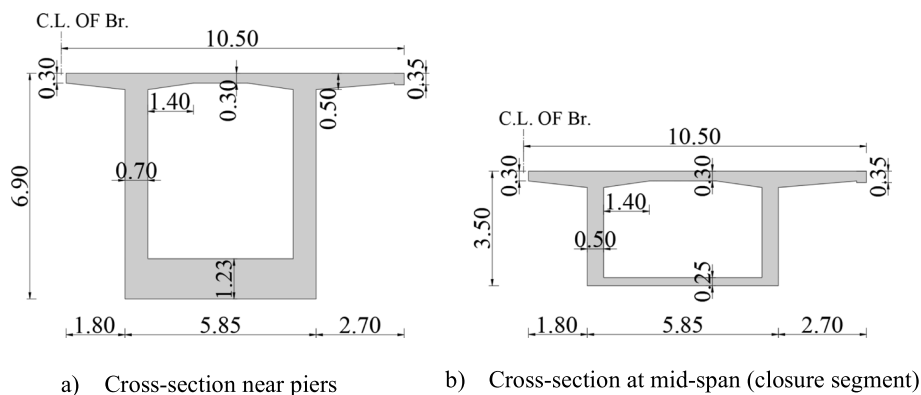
Typical cross-sections of Girga Bridge. a Cross-section near piers. b Cross-section at mid-span (closure segment)
